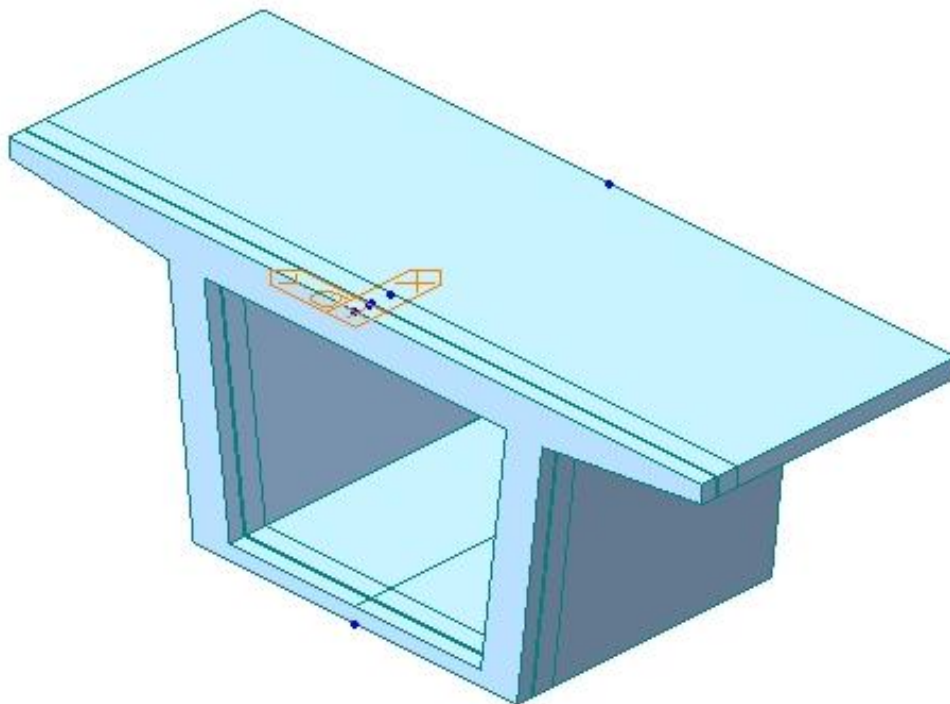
Typical cross-section of a single-cell concrete box girder.
